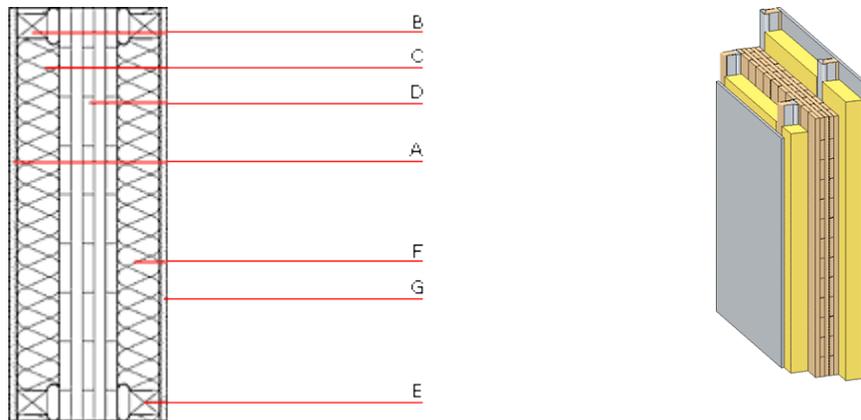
Cross-section configuration and 3D view of compartment wall (dataholz.com 2017).
